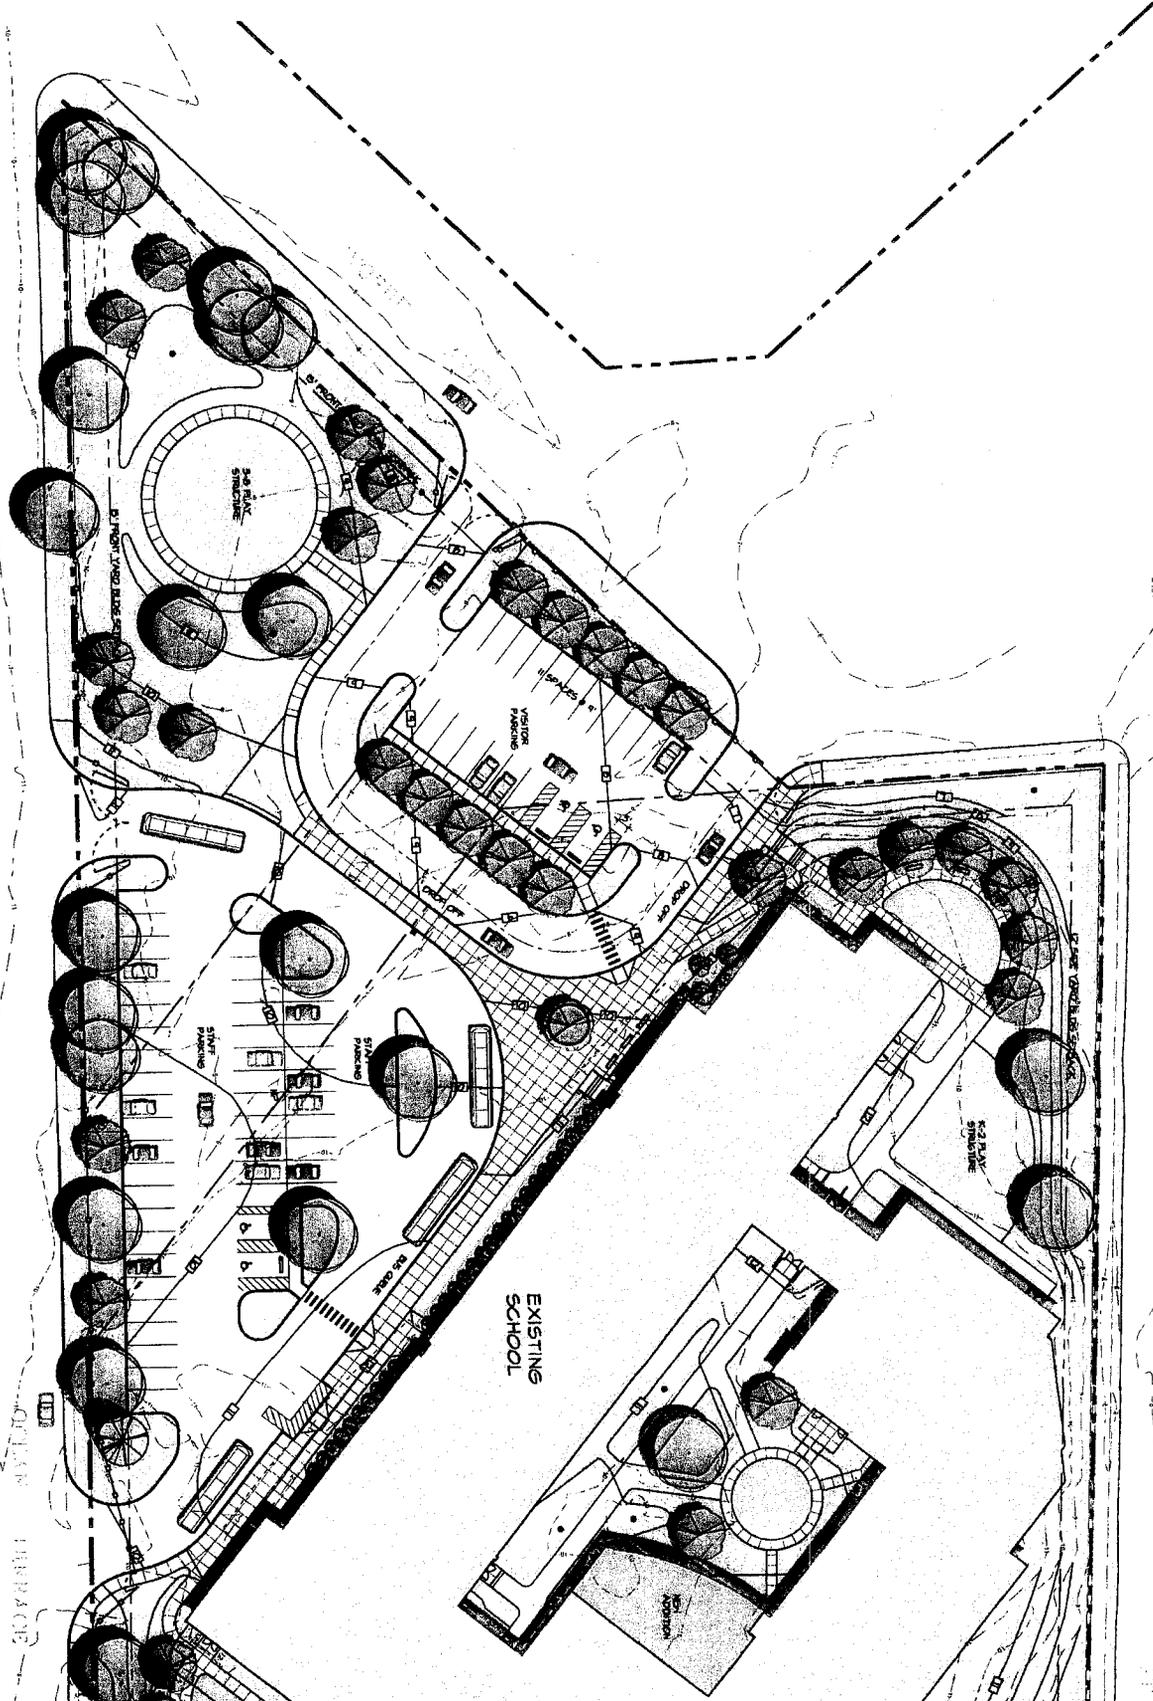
EXISTING LONGFELLOW PLAYGROUND SITE PLAN
